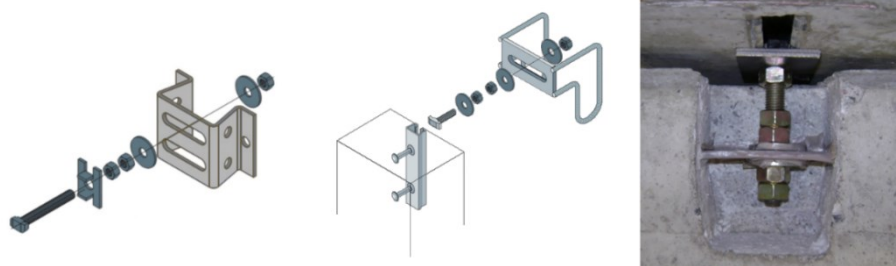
Schematic presentation of the cantilever connection assembly.
